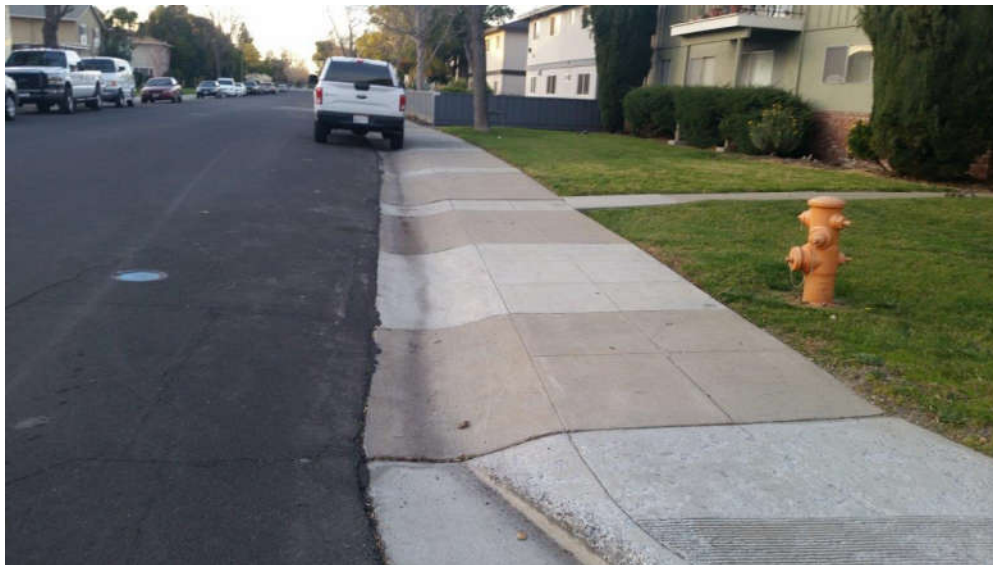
Excessive sidewalk slope, rolled curb and existing fire hydrant does not allow for vault placement.
